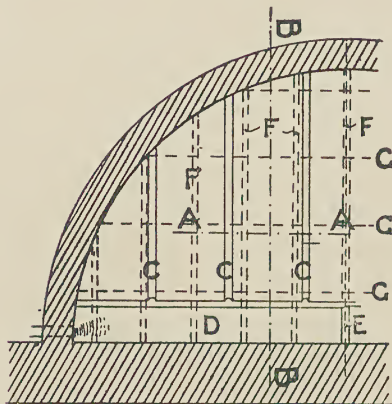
Half-plan of Lead Flat over Bay-window. CC, rolls; D, gutter; E, drip in gutter; FF, 9" x 2" tapering joists; GG, 3½" x 2" purlins.
